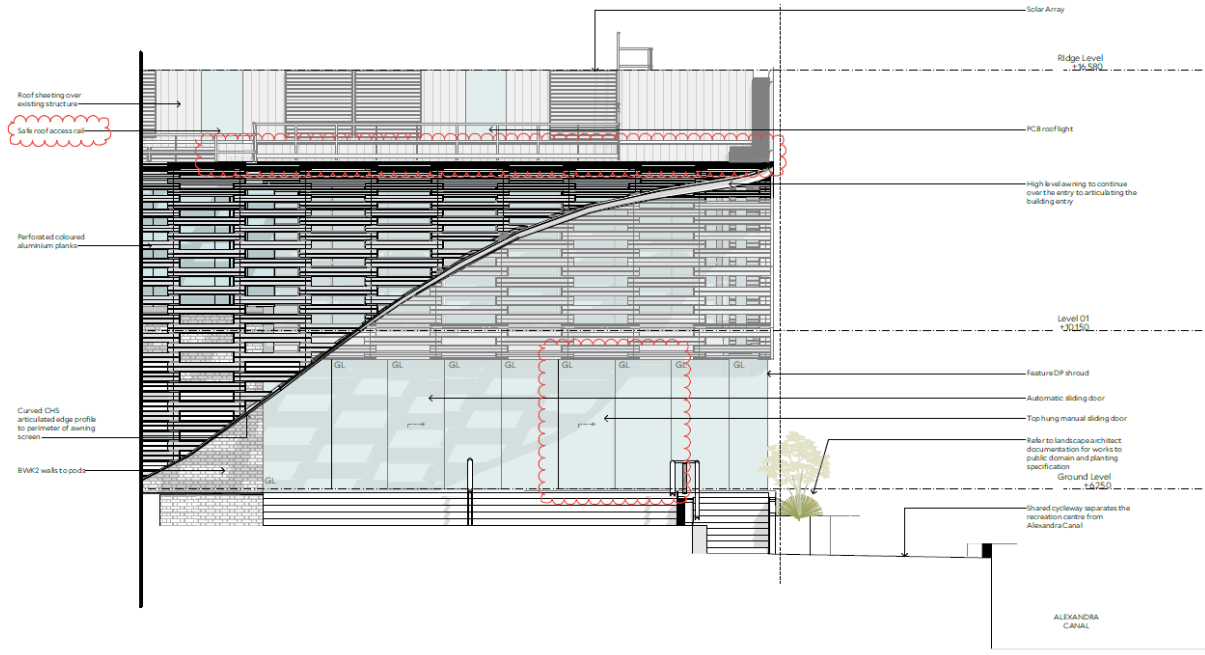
Proposed north elevation - building entry, between gridlines 1 and 3
